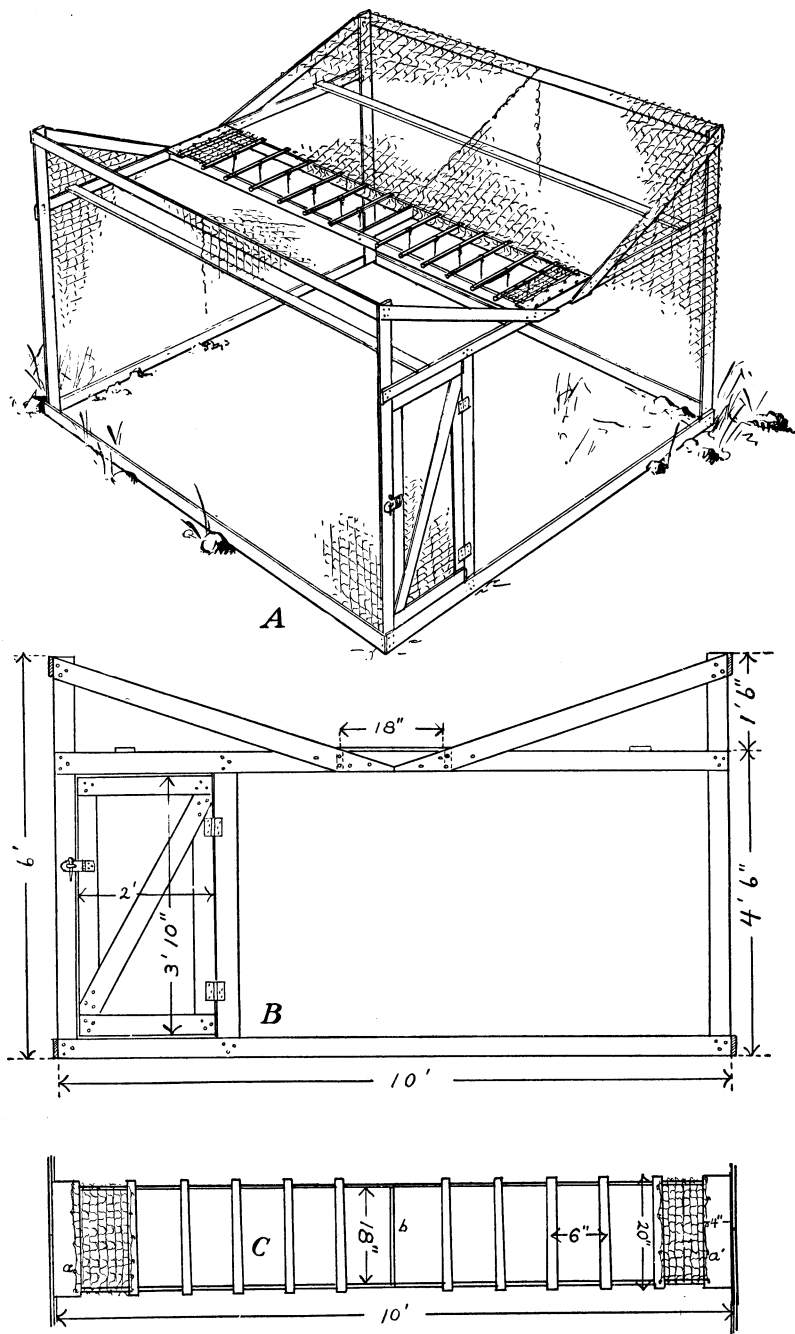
Cage trap of Australian type, for capturing crows, and details of construction: *A*, View of completed trap; *B*, plan of "ladder" opening; *C*, end elevation.
